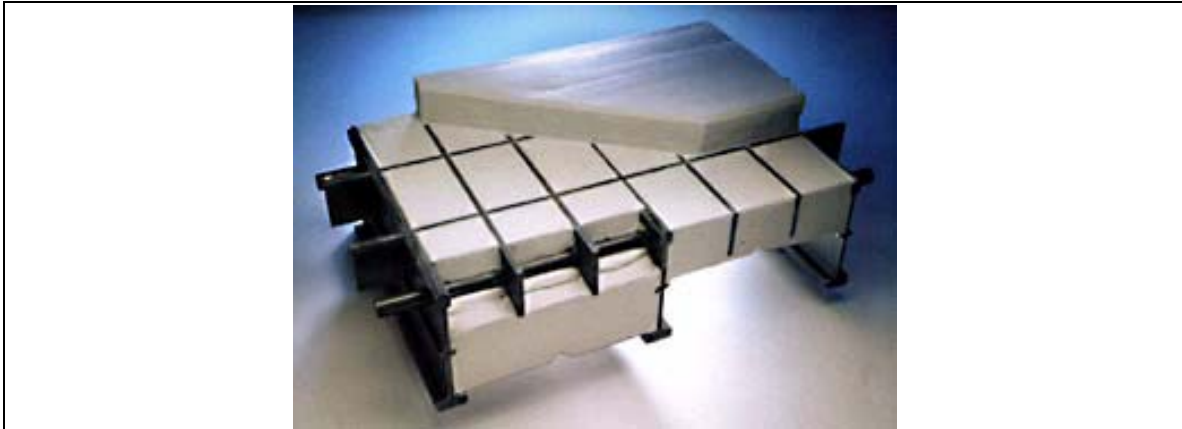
Concrete filled weld-less steel grid deck (IDSI, 2003)
